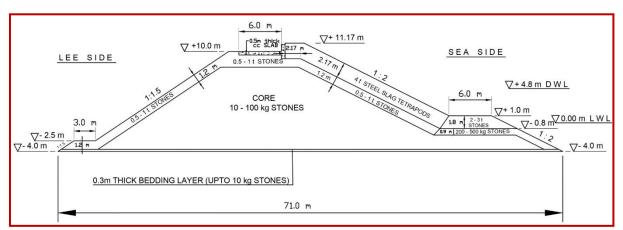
Typical design cross-section of breakwater using Steel Slag Tetrapod
